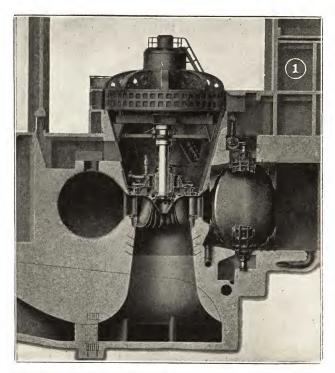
Is a Sectional View through One of the Four 54,000 H.P. 81.8 R.P.M., 89 Ft. Head, Plate Steel Spiral Casing Turbines Built by the Company and Put into Successful Operation in the Conowingo Plant of Susquehanna Power Co. This Sectional View Also Shows One of Four 27 Ft. Diameter Butterfly Valves Designed and Built by the Company and Which Are the Largest Valves of This Type Ever Built
